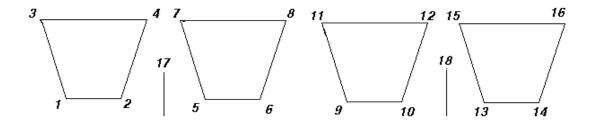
Schematic layout of test sites. Pier 2W view is looking east while 2E view is looking west.
